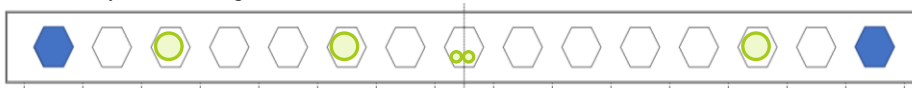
Elevation of the main floor beam showing openings for ducts and piping (Royal HaskoningDHV Internal Document, 2020a)
